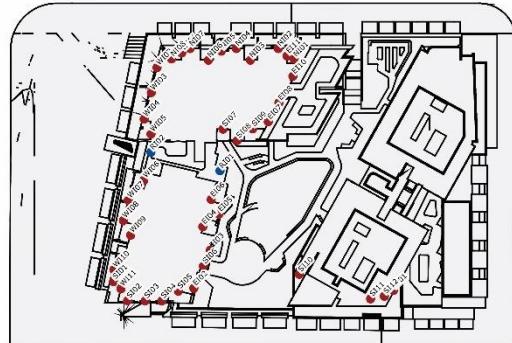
Layout of Pressure Sensors – Level 6 Plan
